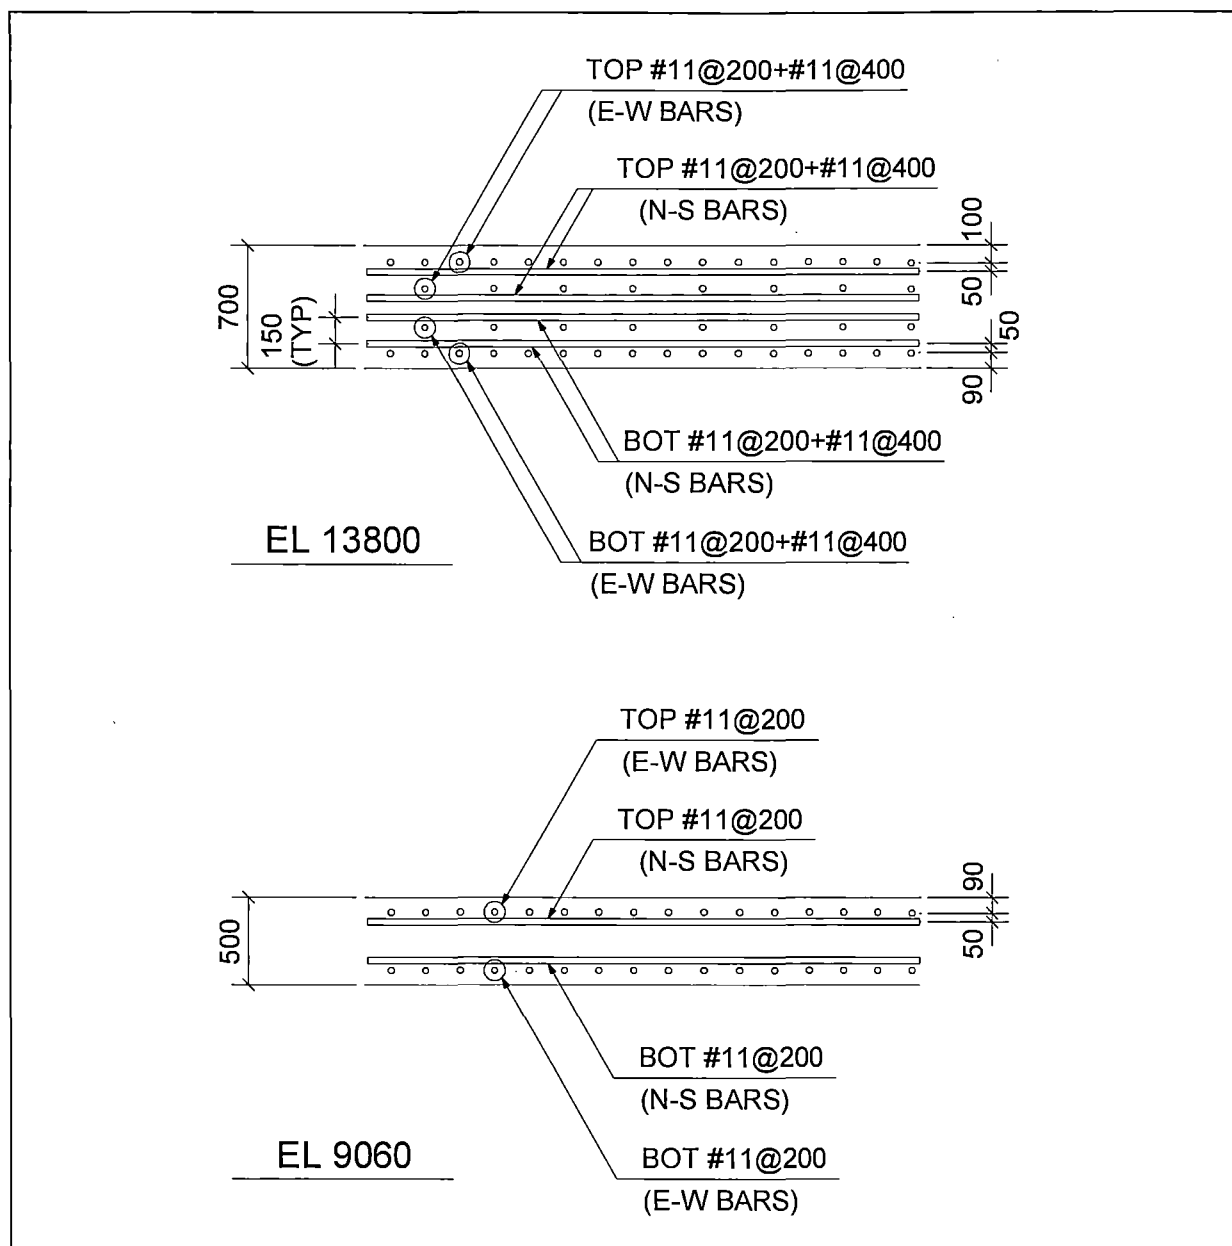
Assumed Floor Slabs Rebar Arrangement (Continued)
